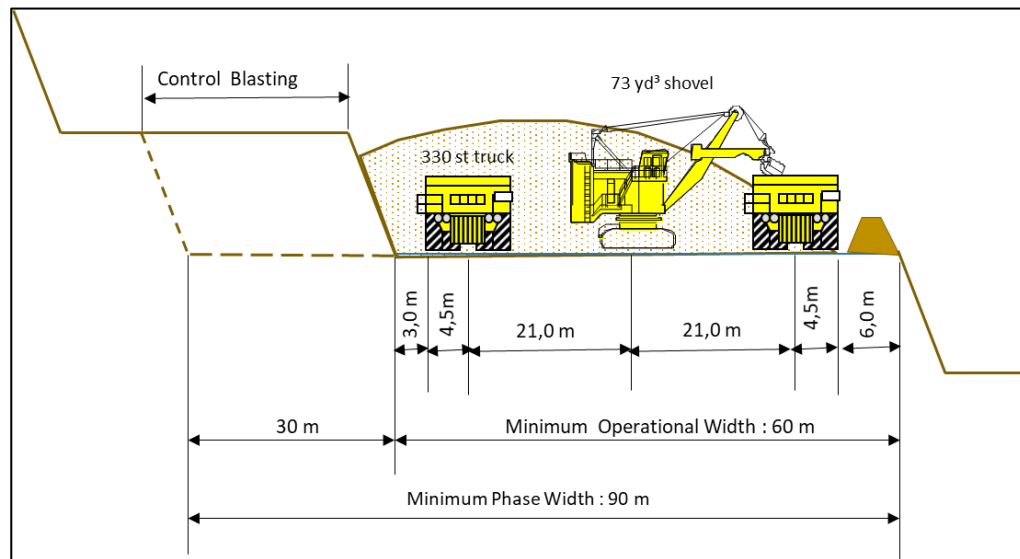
73 yd³ Shovel Loading from One Side + Wall Control Strip
